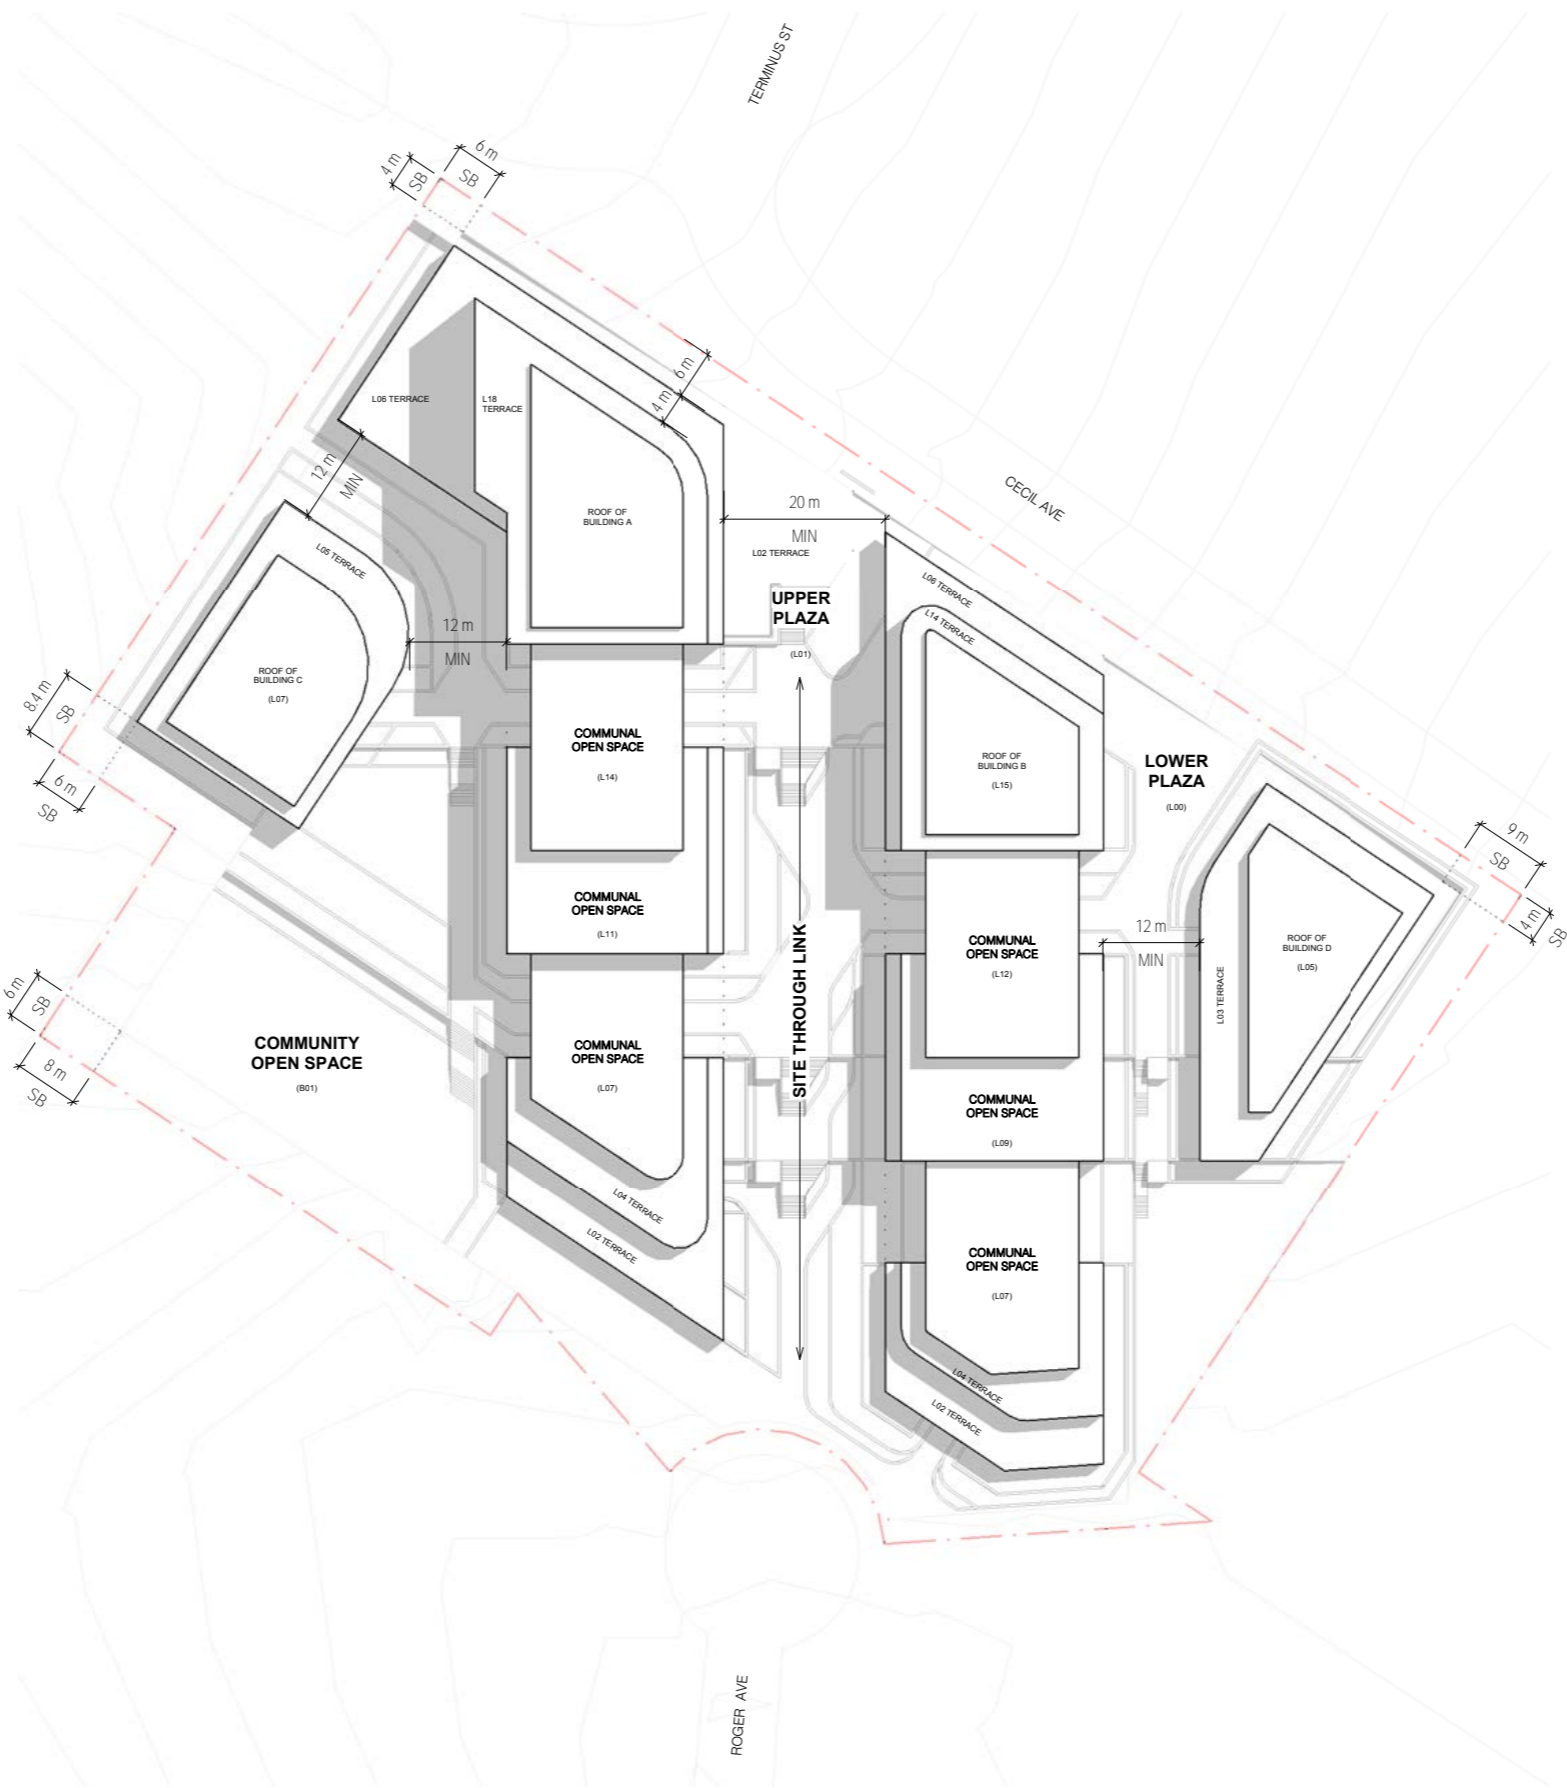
BUILDING SITING AND SETBACK PLAN
